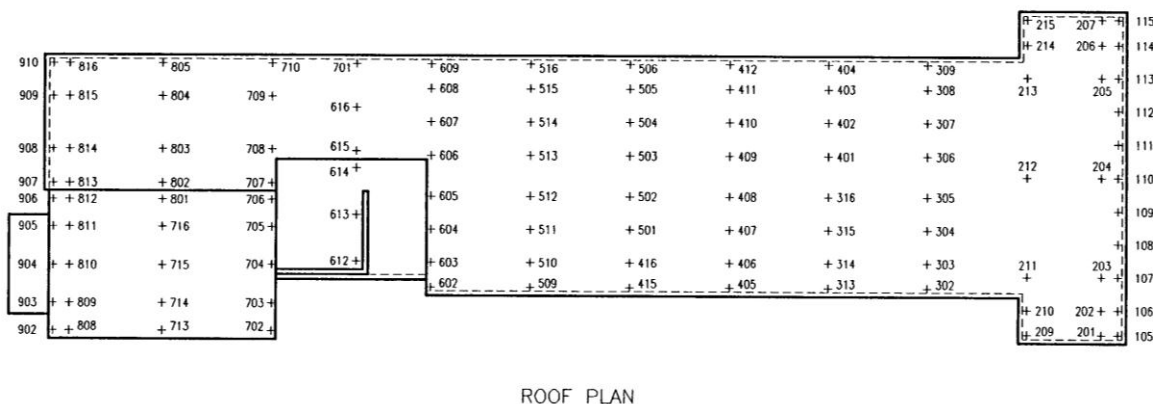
Plan View of School Showing Location of all Pressure Taps Used in the Wind Tunnel Tests (North is towards top of page).
